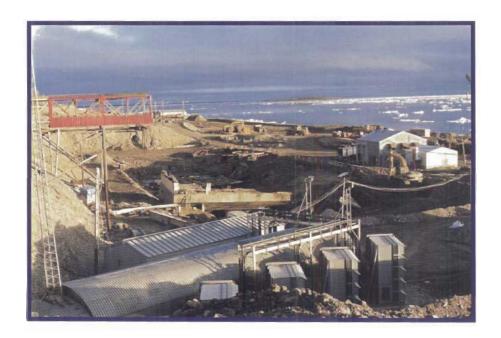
Excavation of process barge with one hull section remaining to be removed.
